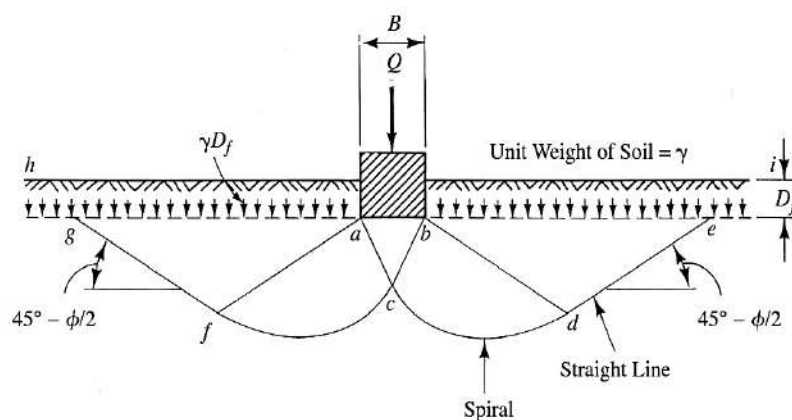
Bearing capacity failure in soil under a rough rigid foundation
